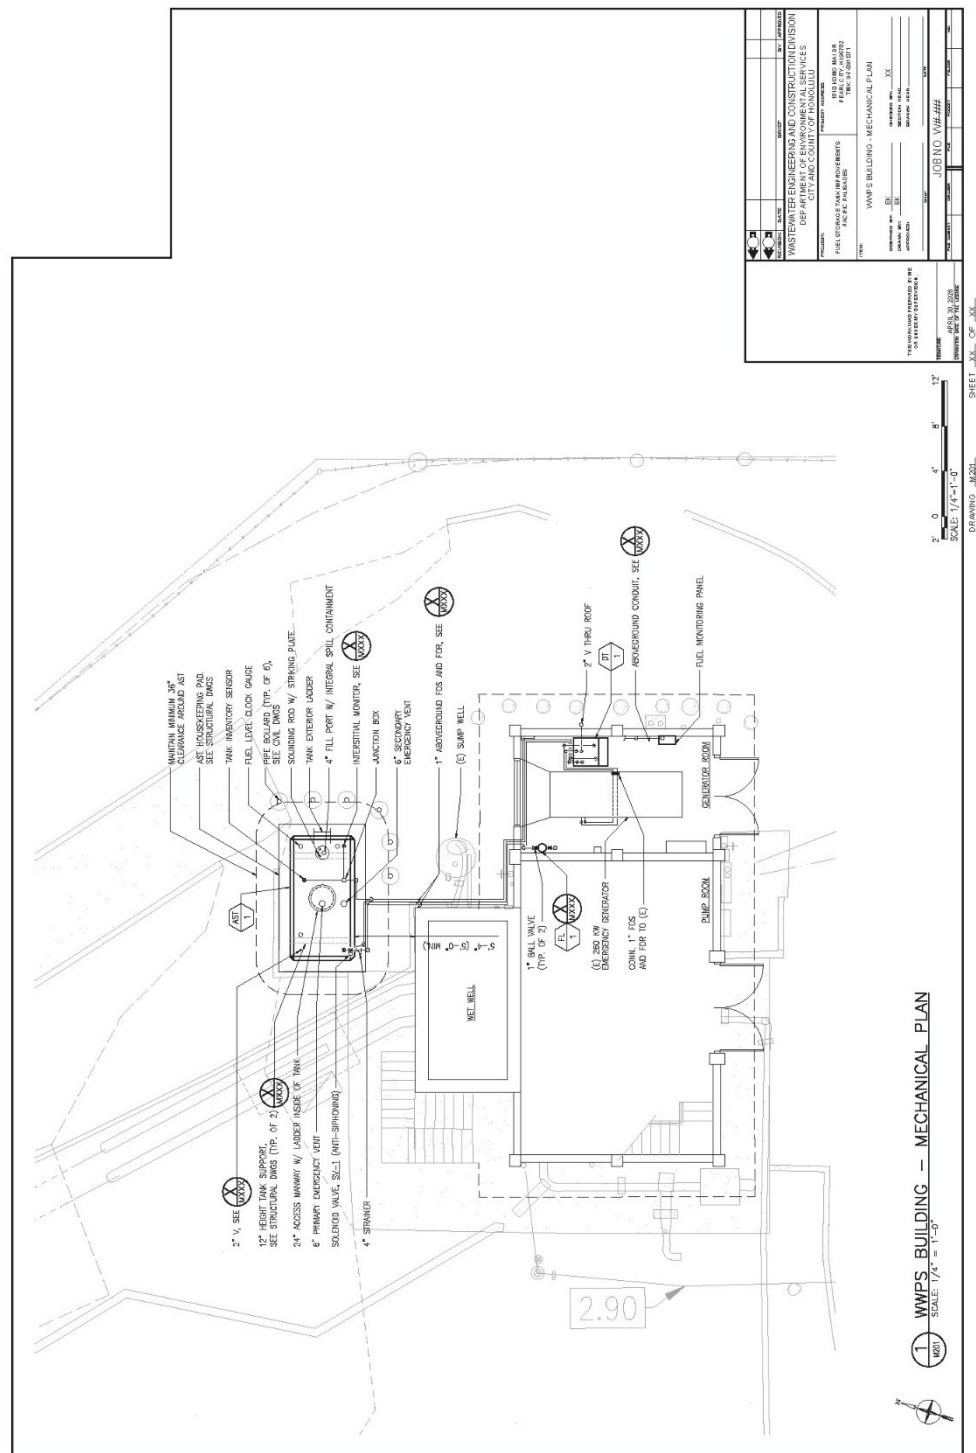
Floor Plan (Okahara and Associates, Inc., 2025)
